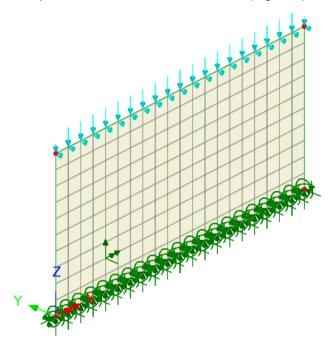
Concrete wall subjected to vertical and lateral loads.
